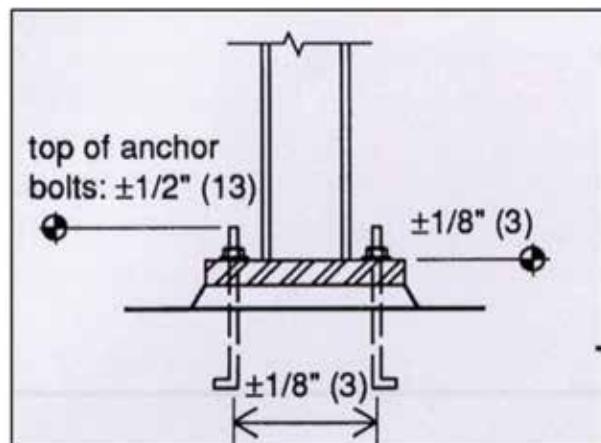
Example of an anchor bolt with elevation tolerances
